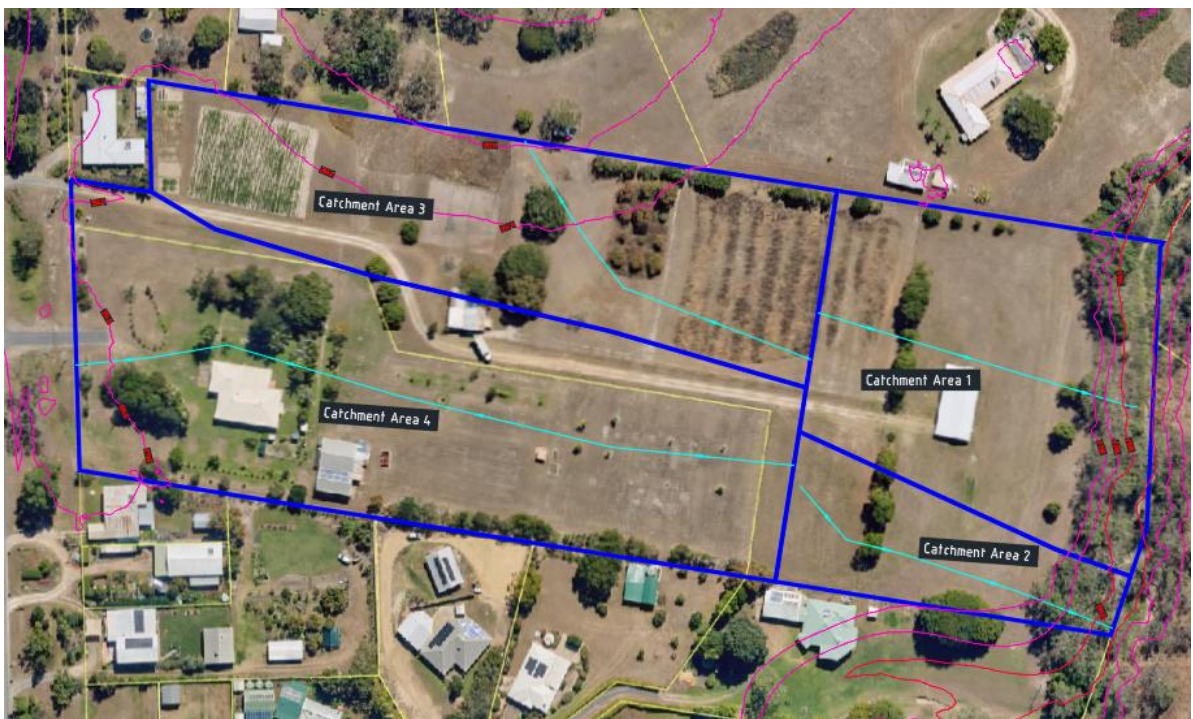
Existing stormwater infrastructure surrounding the subject site (Source: Topographic LiDAR Survey)
